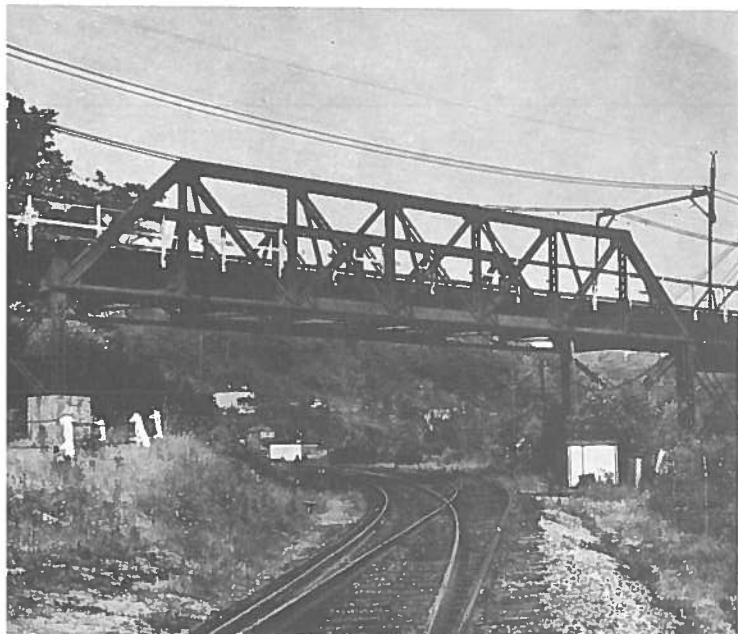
THROUGH TRUSS, PENNSYLVANIA
